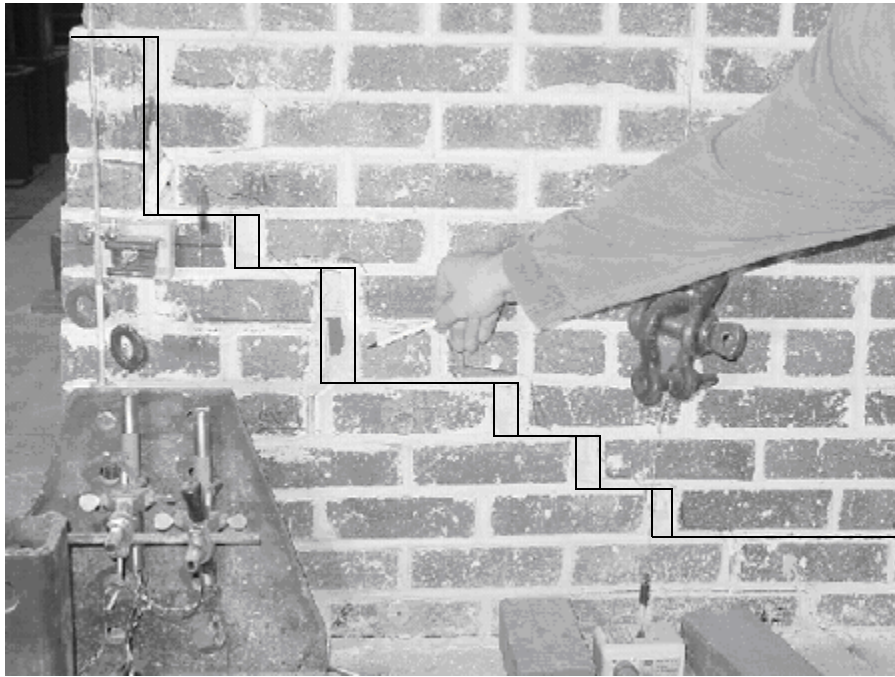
Photograph showing the offset at the corner of Wall 1 and Wall B due to the sliding deformation of pier P1-6 in the negative direction
